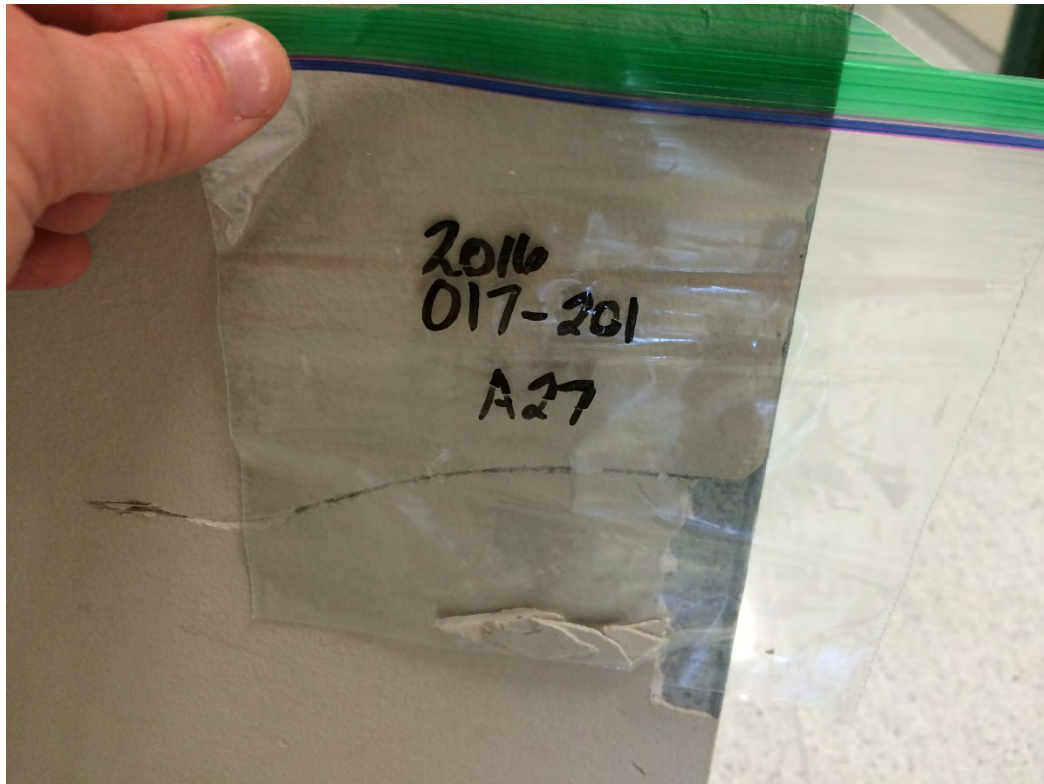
Asbestos sample A27, drywall joint compound collected from wall in O17-201. No asbestos detected.
